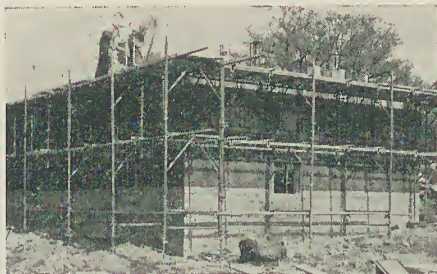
STEEL SHUTTERING FOR WALLS OF NO-FINES CONCRETE.
